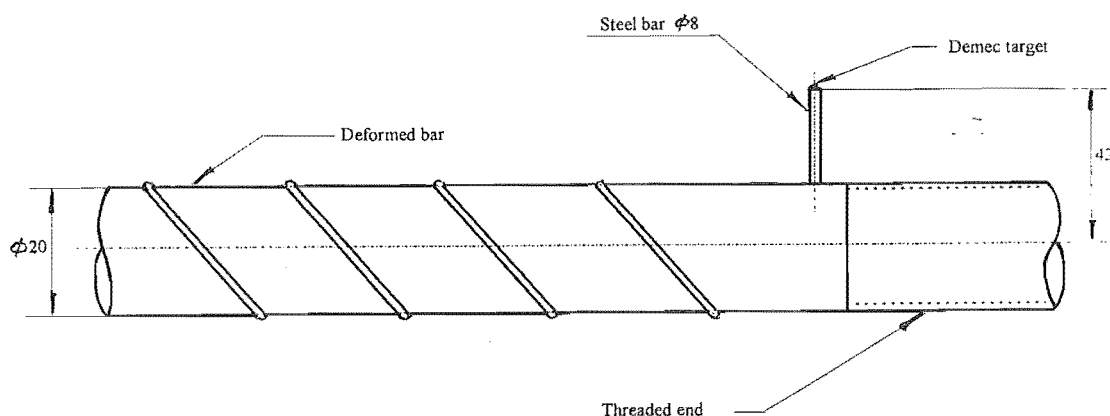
(b) Layout of DEMEC gauge target installation on a deformed bar (Not to scale)
